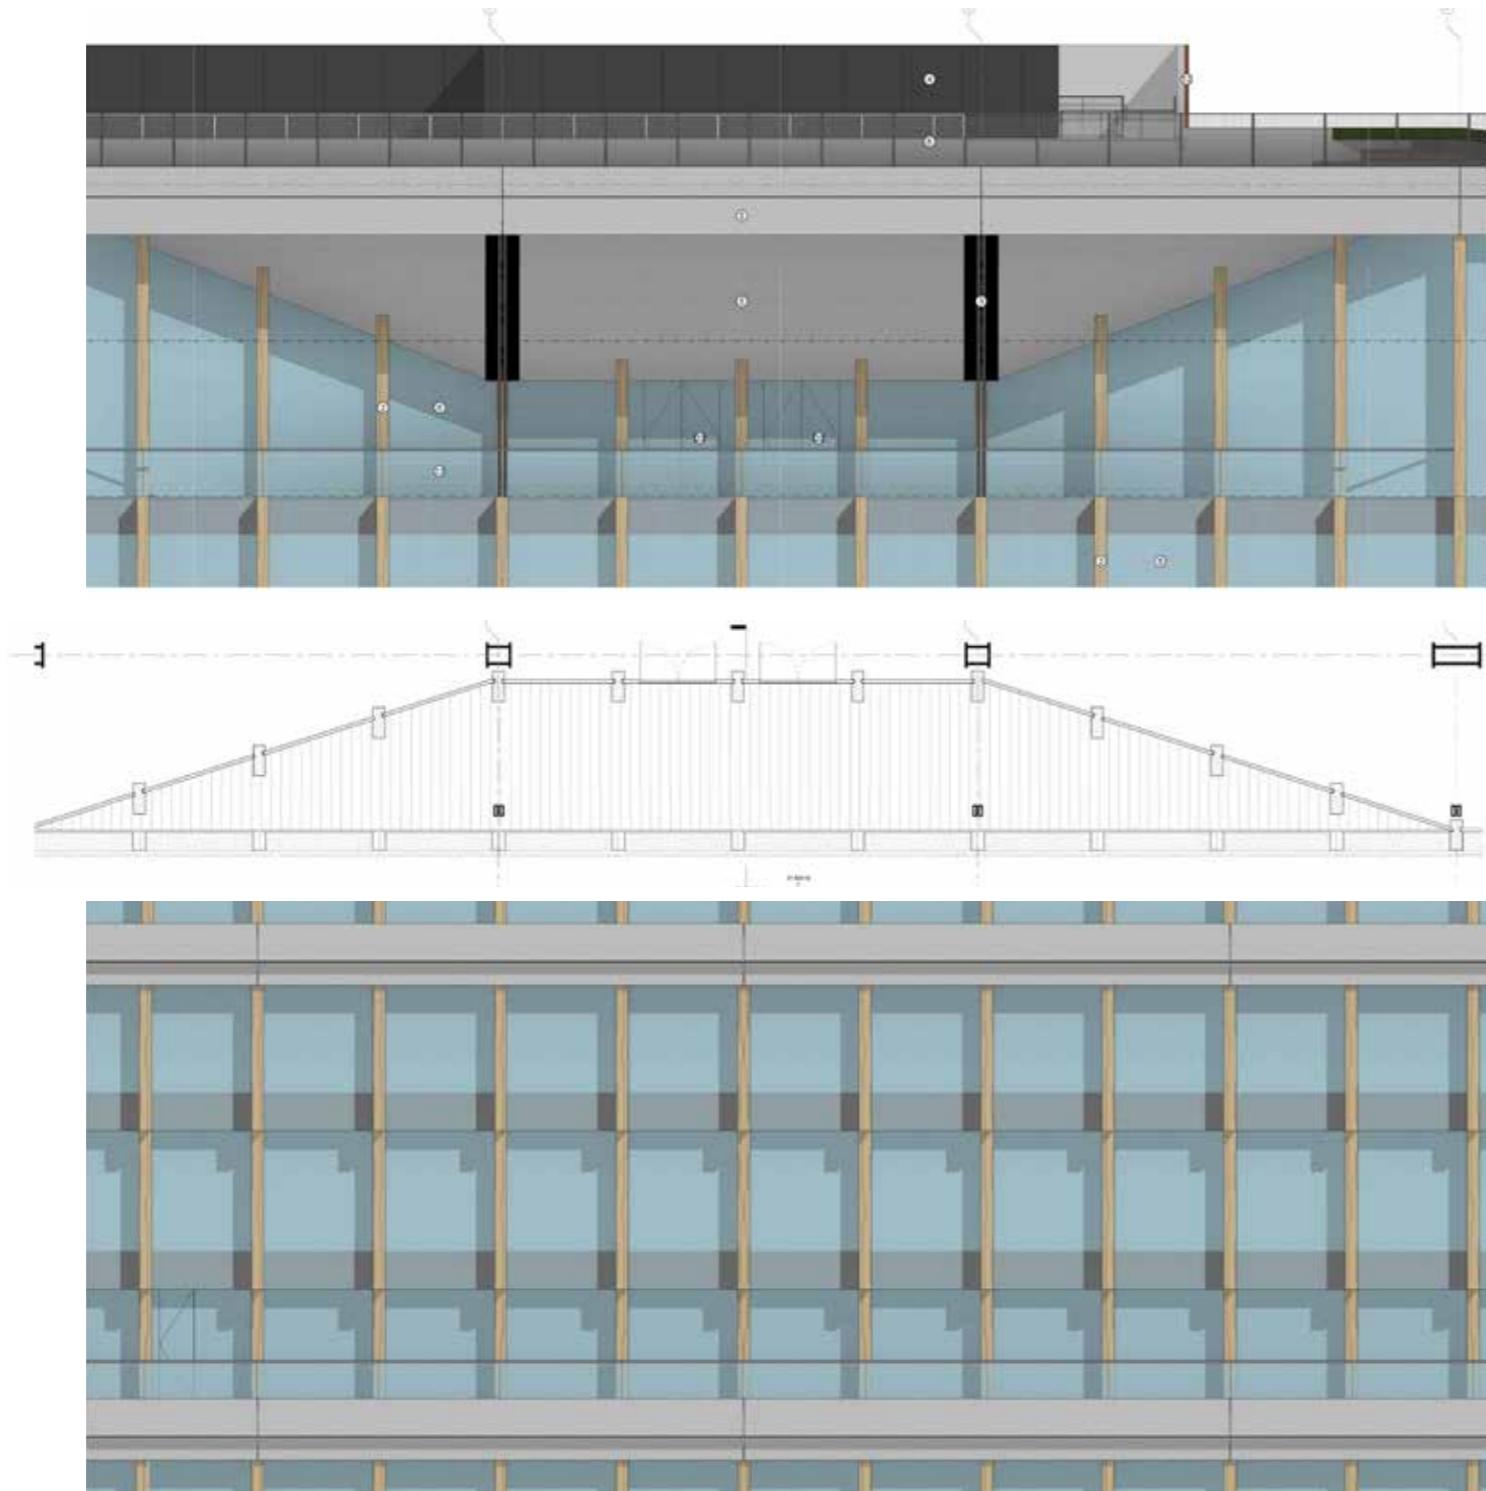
Elevation and plan showing the materiality of the tenth floor balcony on the north facade (top) and bay study of three storey element showing stepped timber mullions and expressed floorplates
